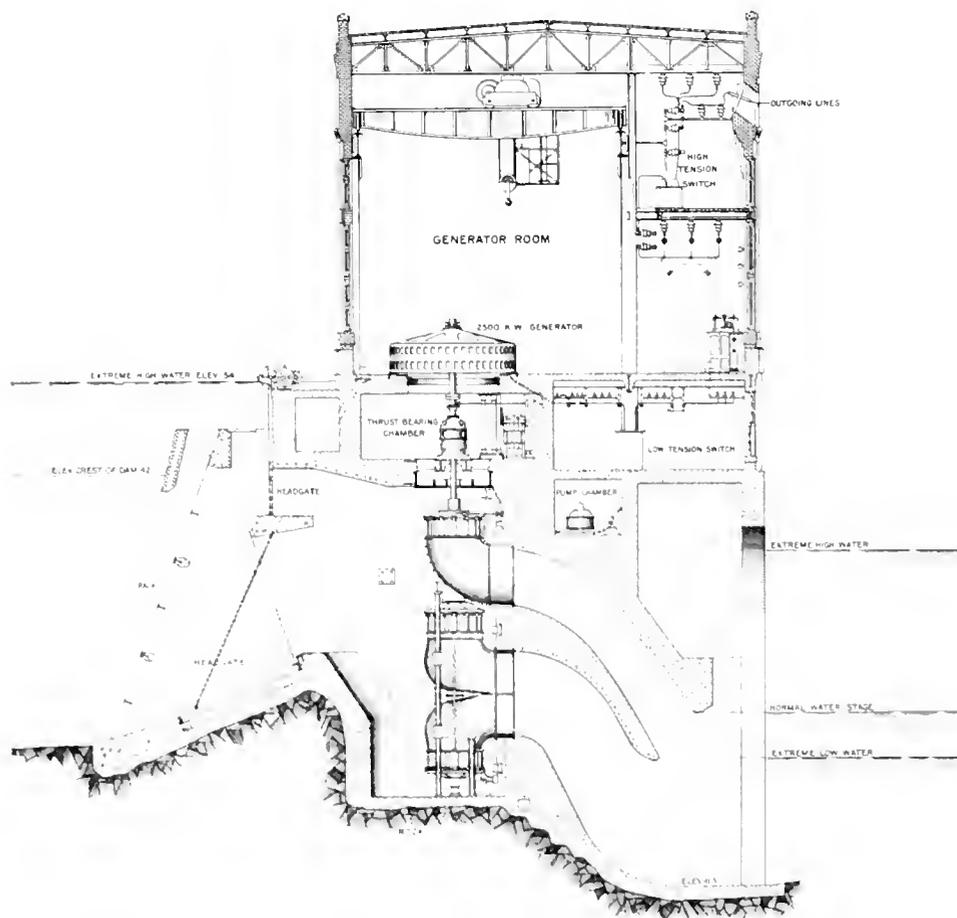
Cross Section of Power House Showing Construction of Waterwheels and Location of Apparatus
